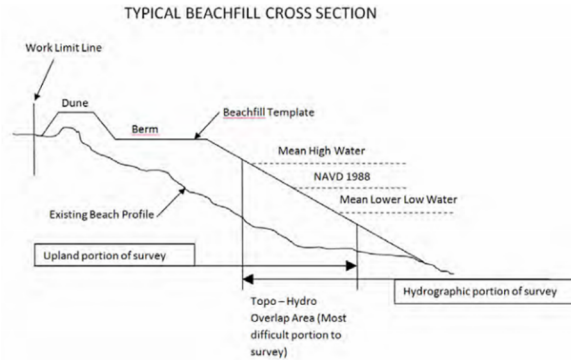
Typical beach nourishment fill cross-section with dune and berm construction [2].
